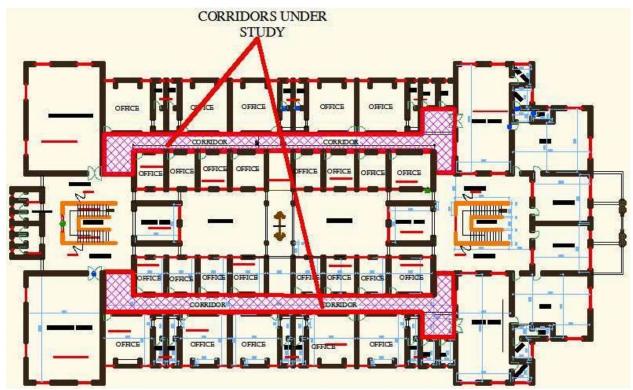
First floor plan of Surveying/Geoinformatics & Building Departments showing corridors under study
